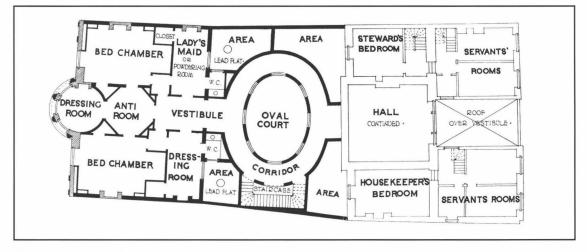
Robert Adam, first-floor plan of Mrs Fitzherbert's house, 1787. (Source: Arthur Bolton, The Architecture of Robert and James Adam (1922).)
